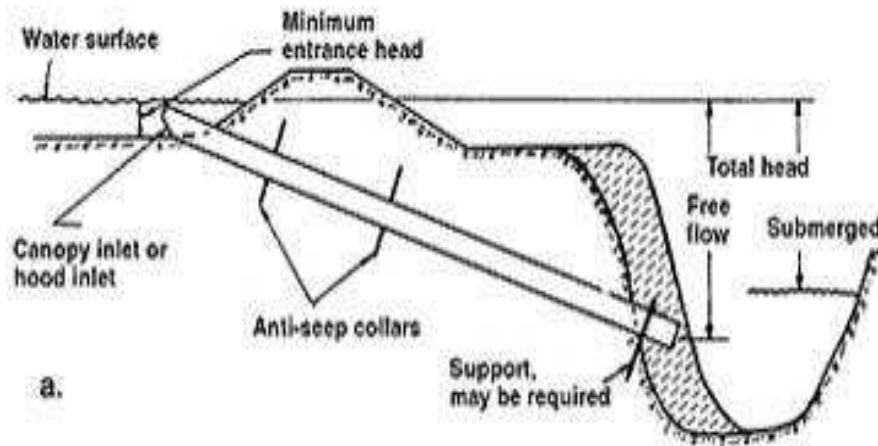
GRADE STABILIZATION STRUCTURE (STEICHEN, 1993)
